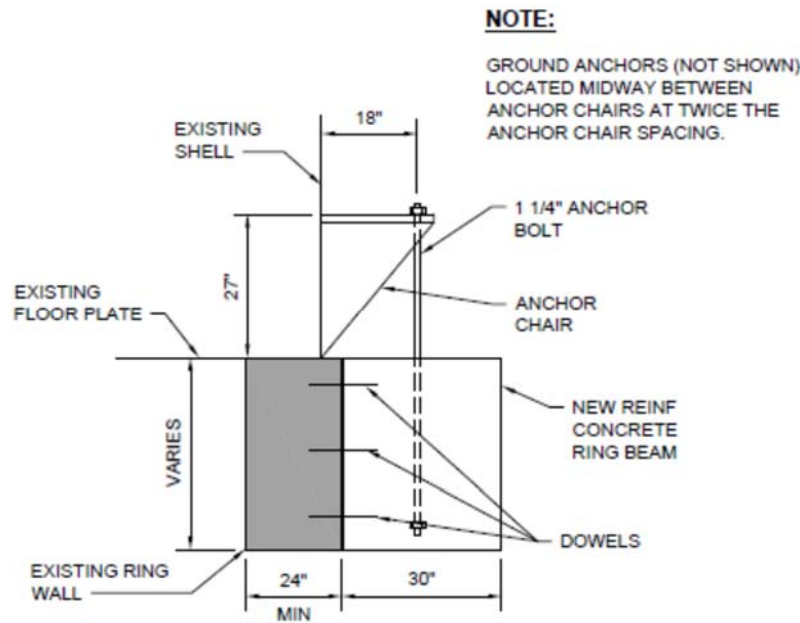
Supplementary External Ringwall with Anchor Bolts and Ground Anchors
